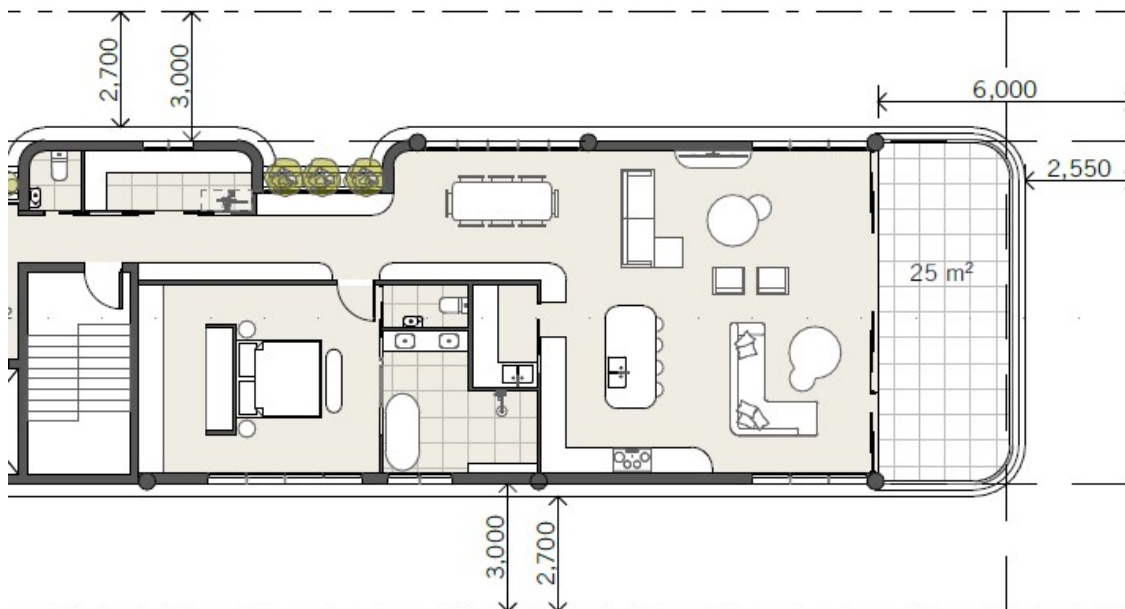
Partial level 7 floor plan (Source: Lightwave Architecture)
